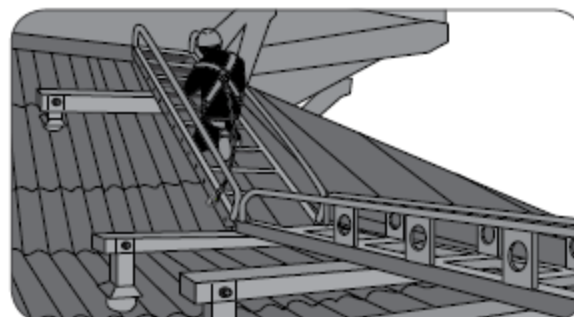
Crawler boards, gangways and perimeter guard-rails can enhance safety for work on pitched roofs.
